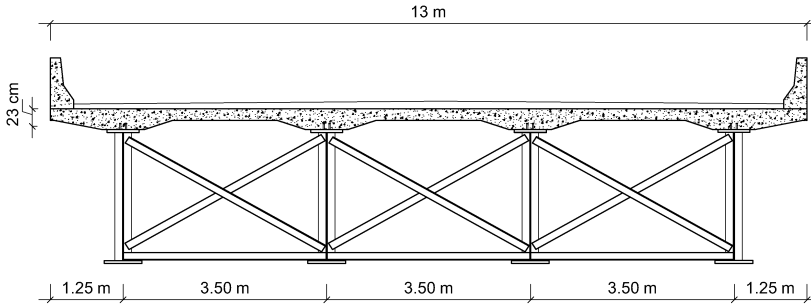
Cross-section of the bridge studied in Pinho & Bellei (2007) and Leitão et al. (2011)
